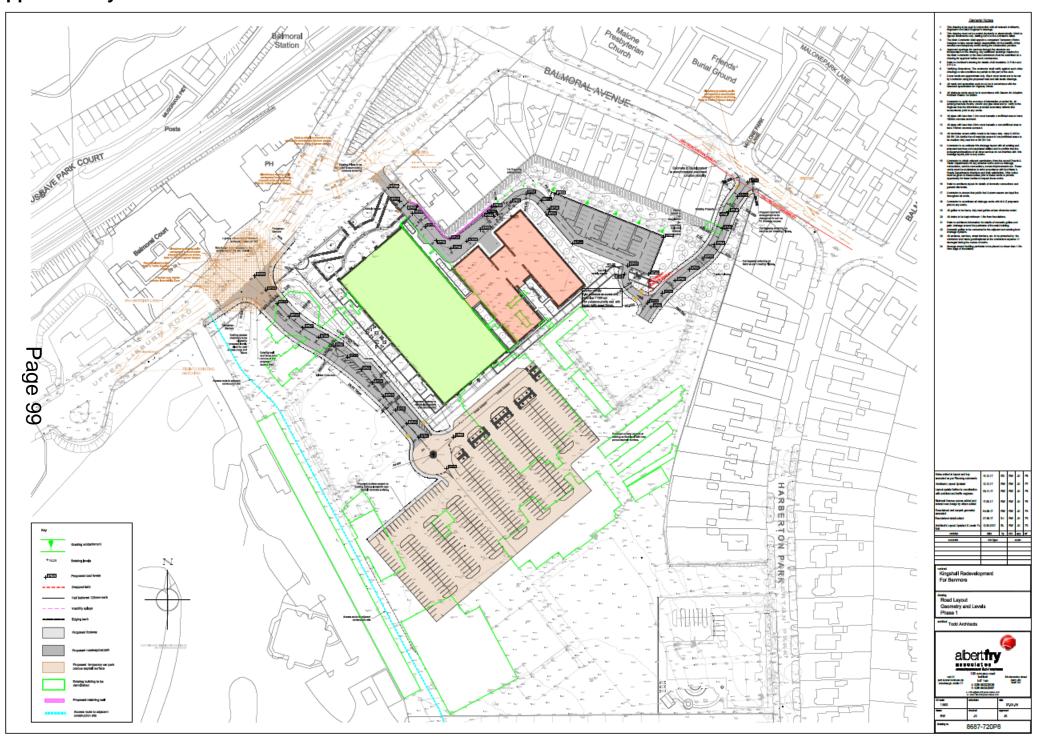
(8687-720P8) - Road Layout Geometry and Levels Phase 1
